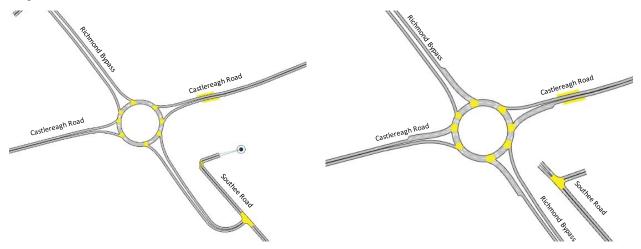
Richmond bypass and Castlereagh Road intersection upgrade (Location 8): Stage 2A layout (left) and proposed upgrade (right)
